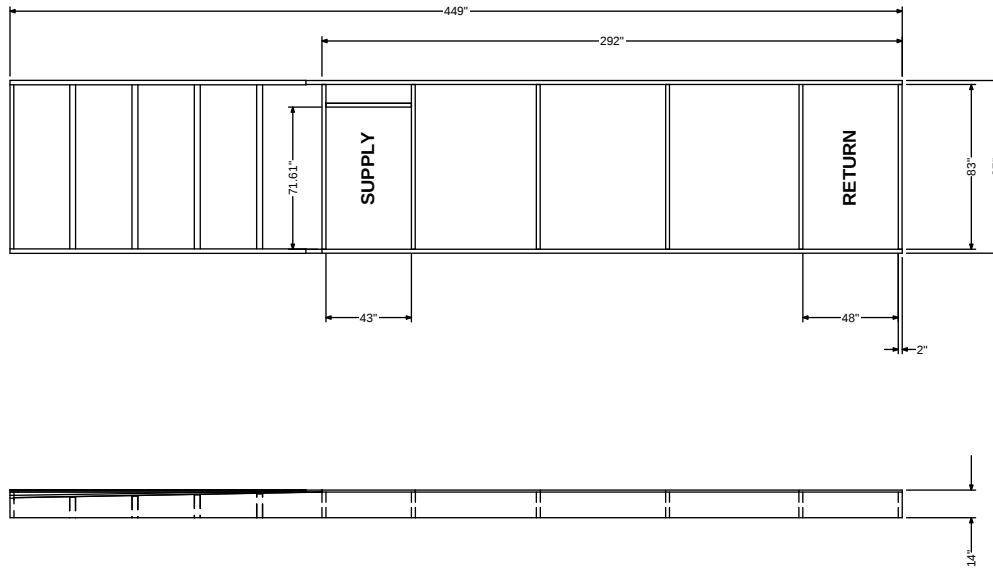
GENERAL ARRANGEMENT DRAWING
